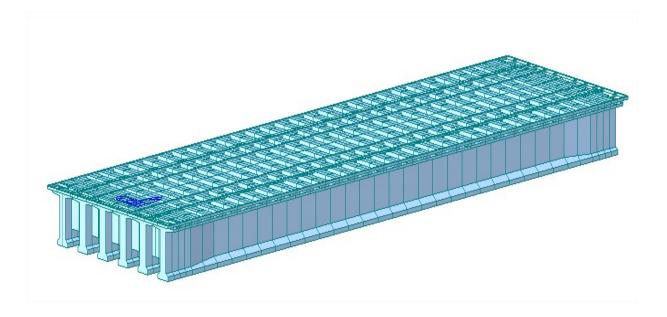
Grillage Model Showing 3-D-Iso-Metric View
